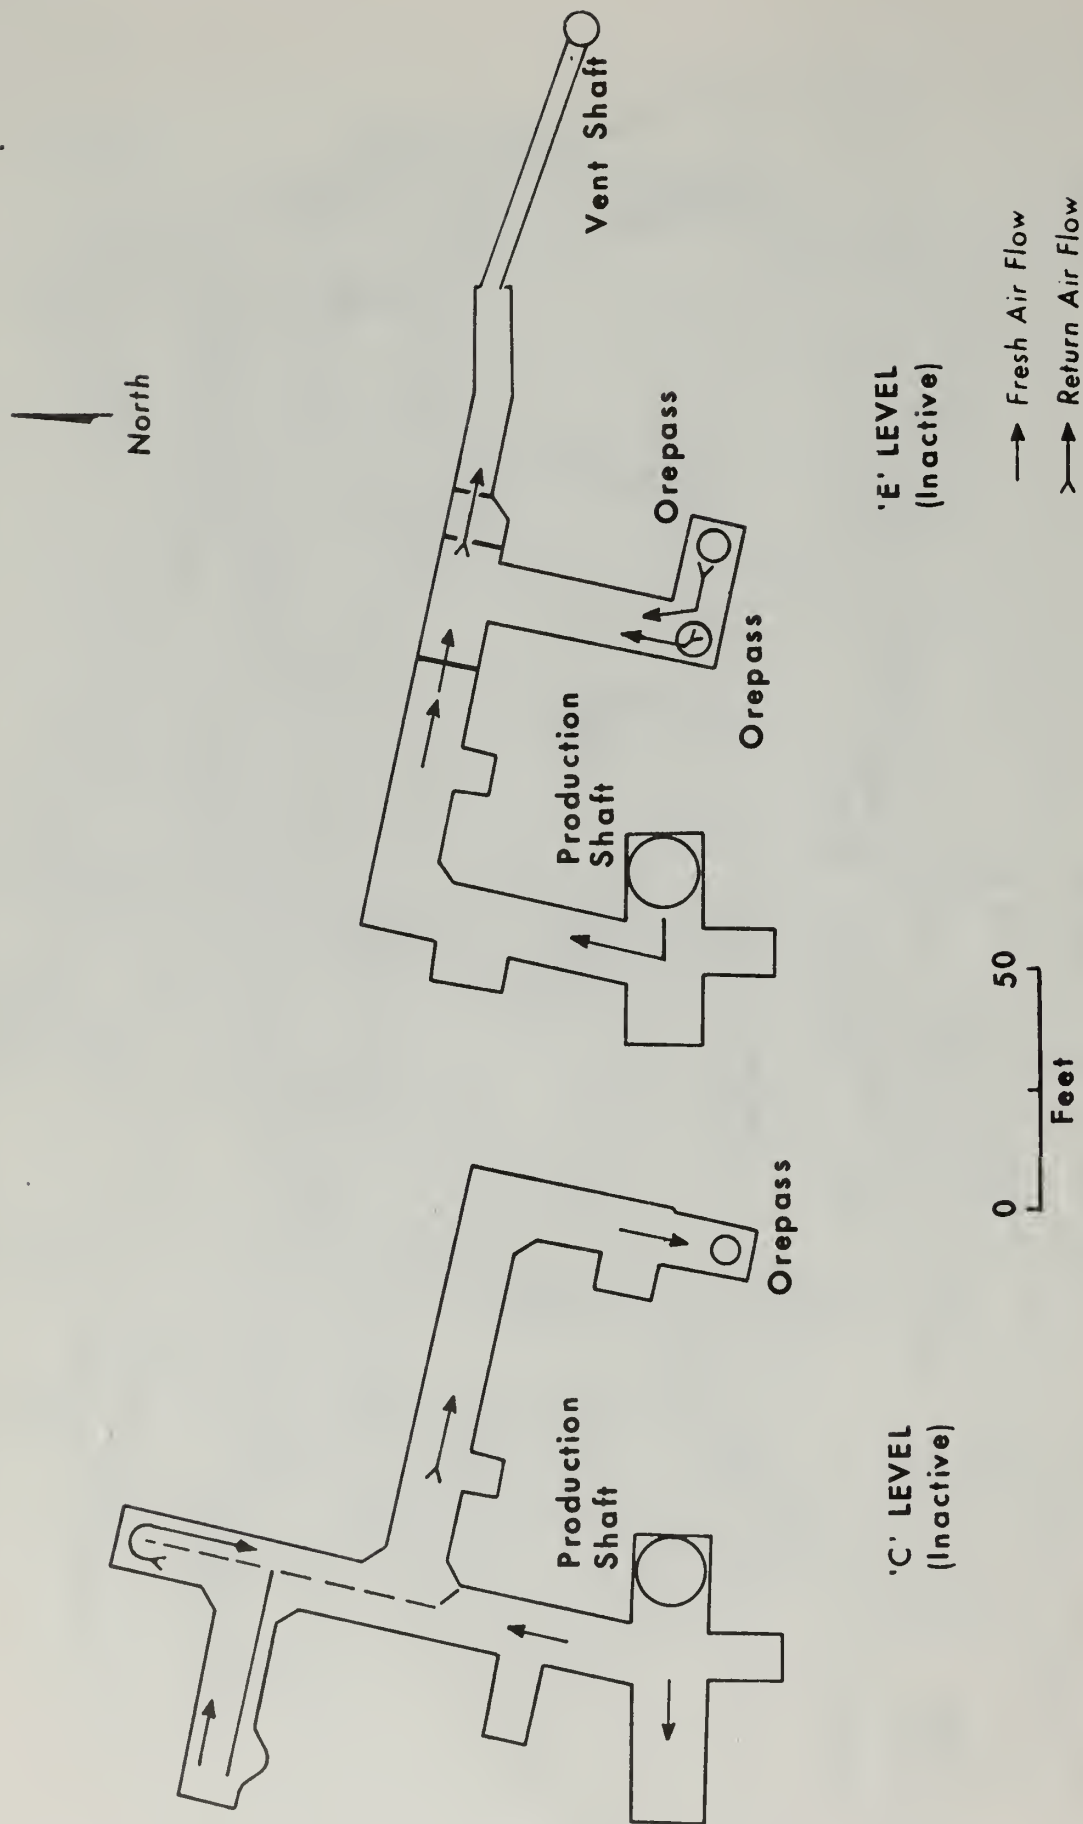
'C' and 'E' Level Design and Ventilation Plan
